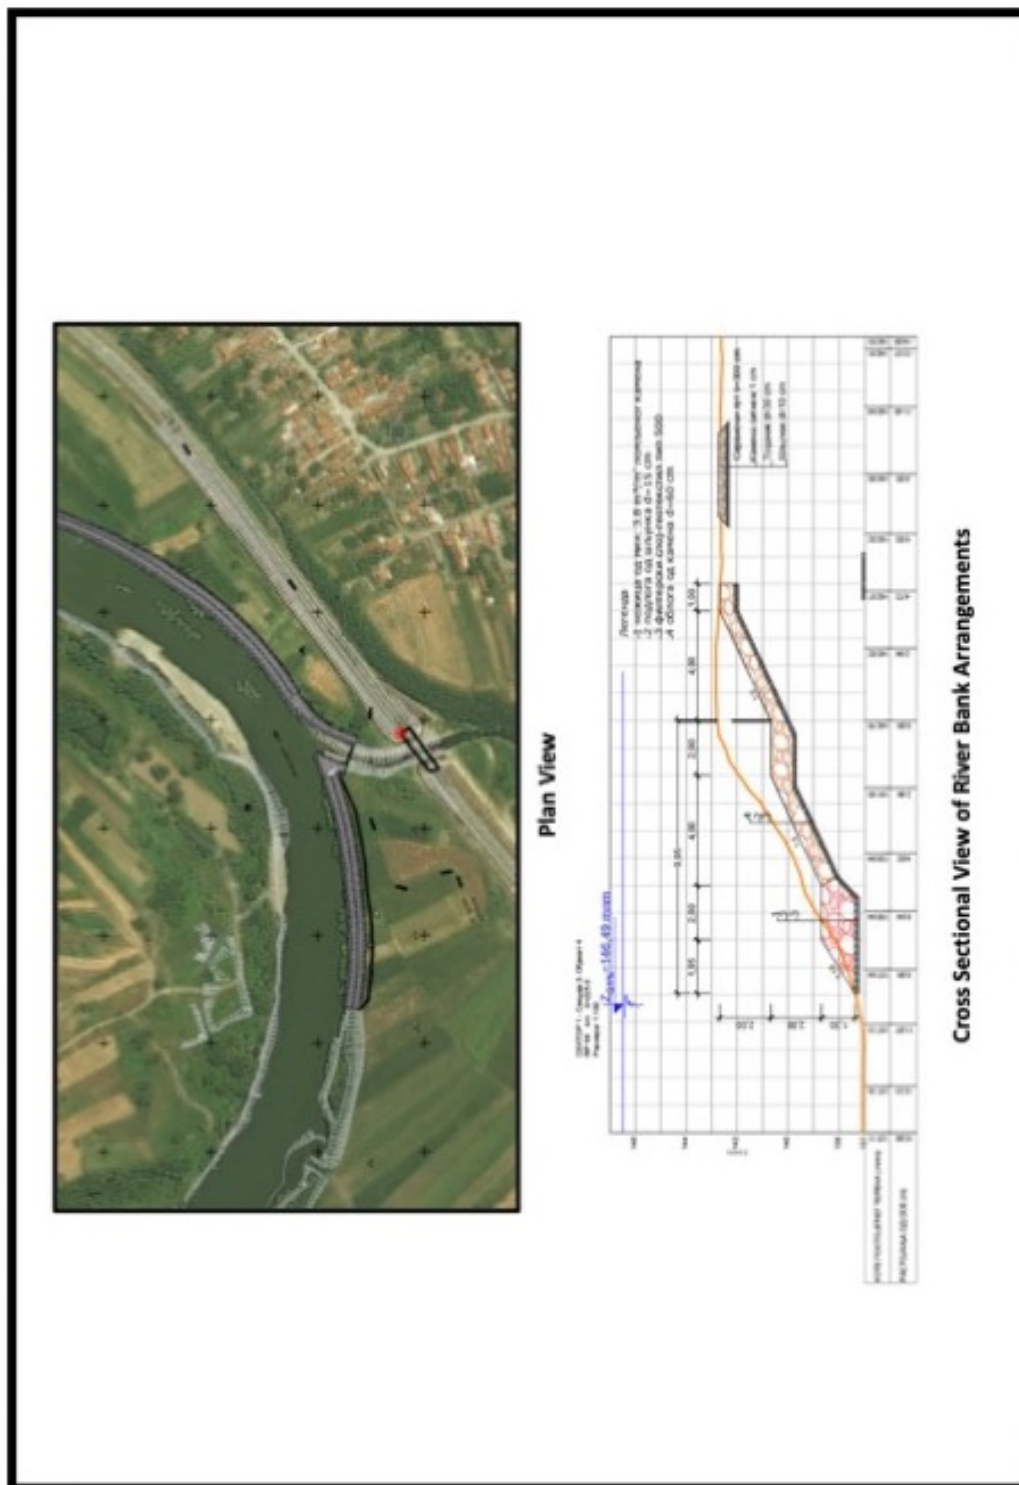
The route and typical cross-section of the Structure 4, Section-1
